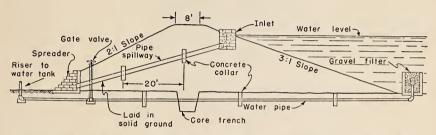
Cross section of fill showing core trench, pipe spillway, water pipe, side slopes, and top width.
